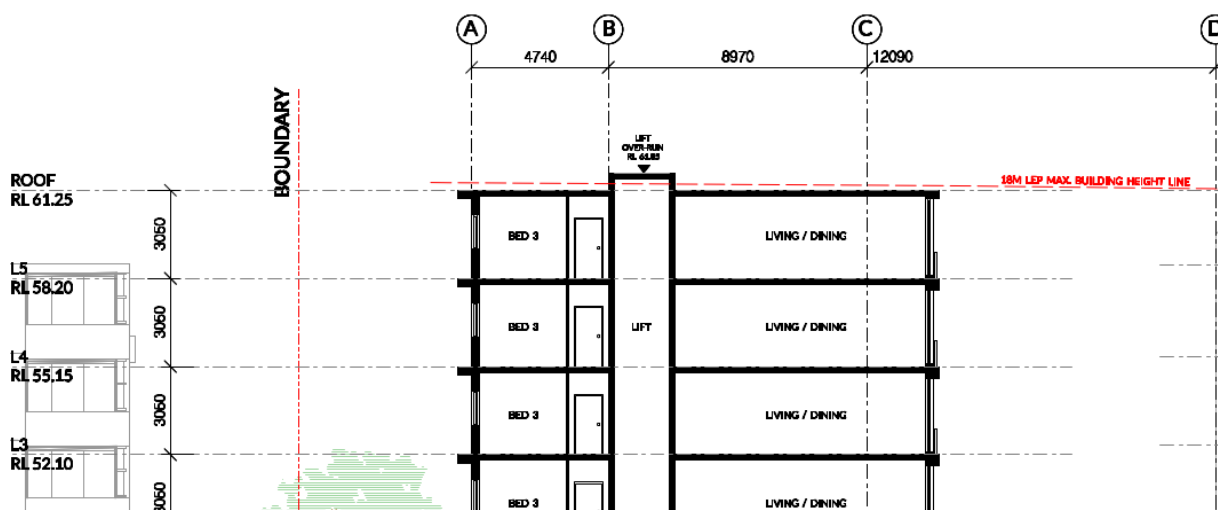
Extract of the west building in Section A-A (Drawing No. A-2500)
